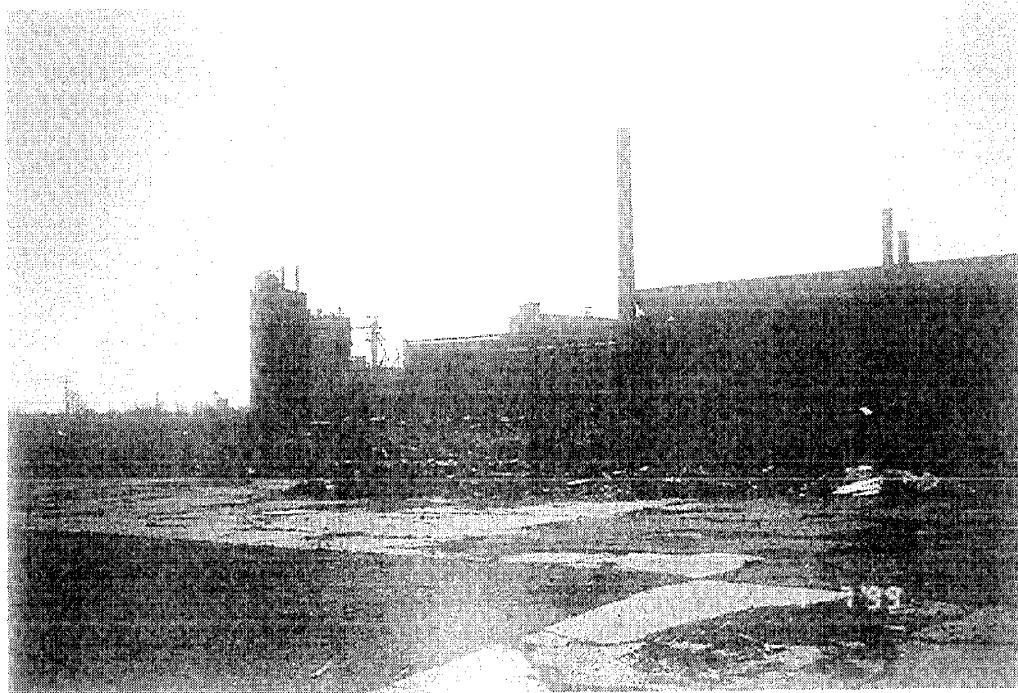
View of the midsection of the Hazorb Site from the loading dock at the northeast corner of the site, facing southwest.
